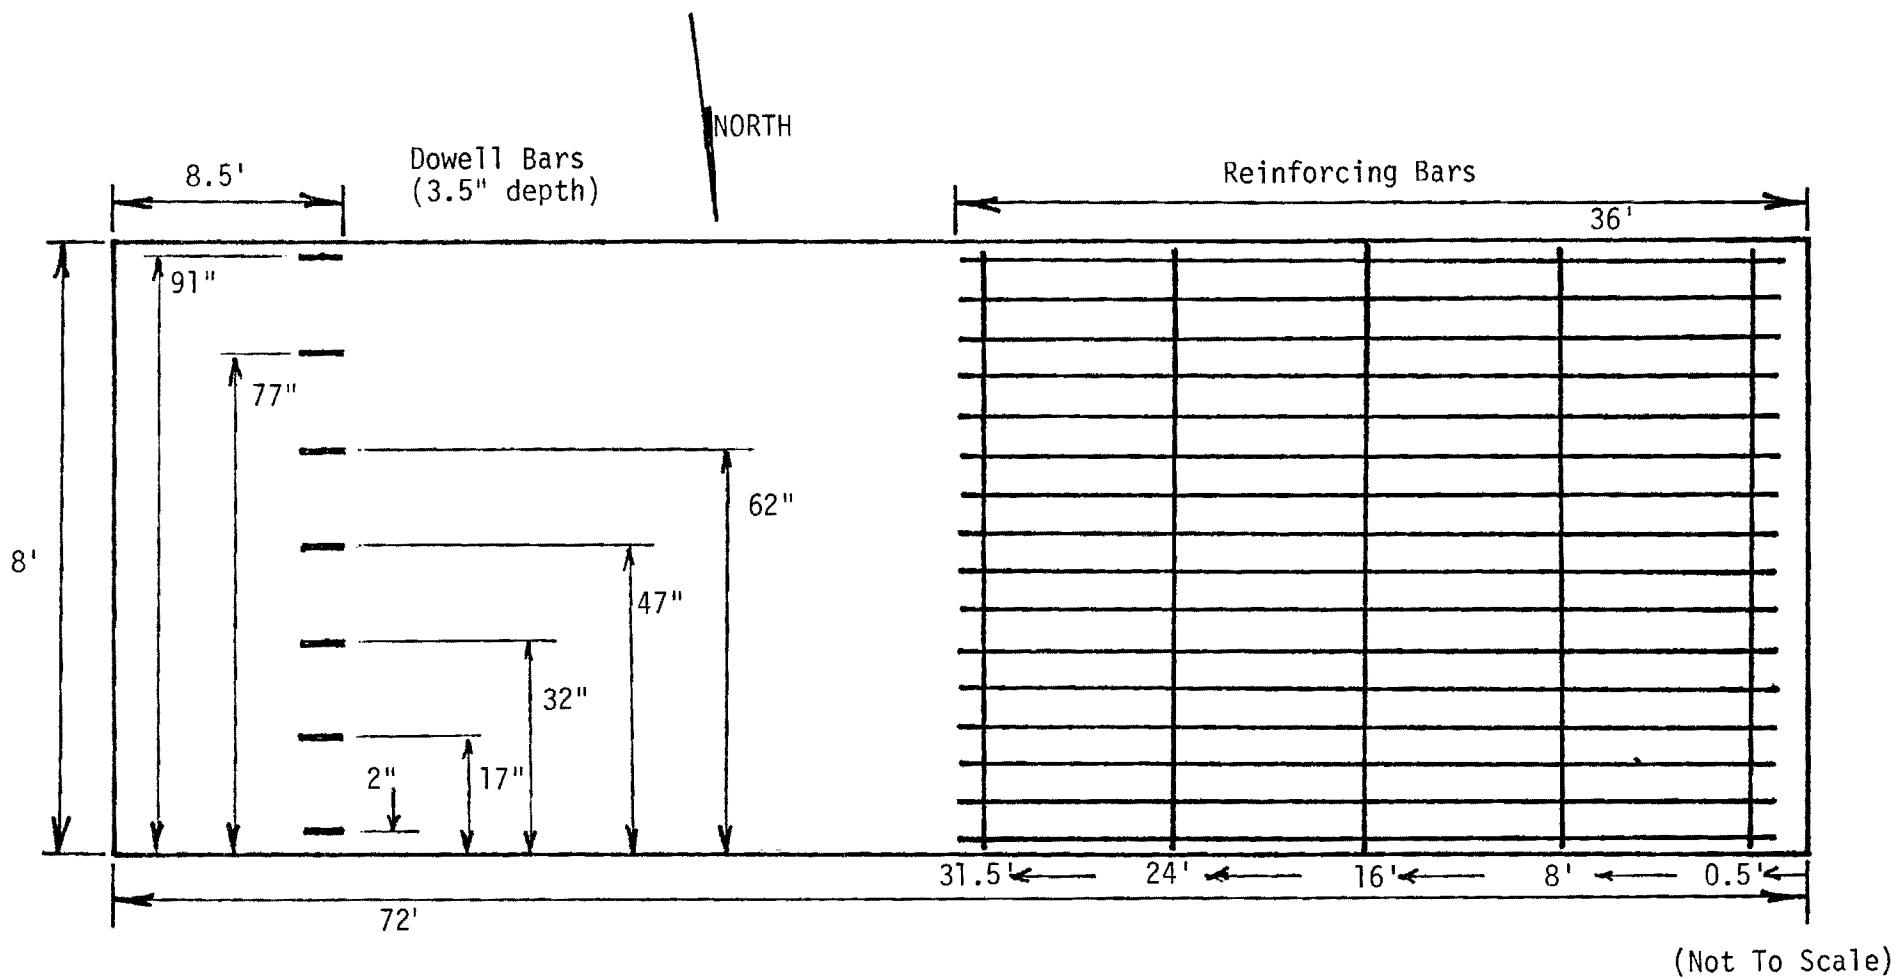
PLAN OF REINFORCING BARS AND DOWELL BARS.
